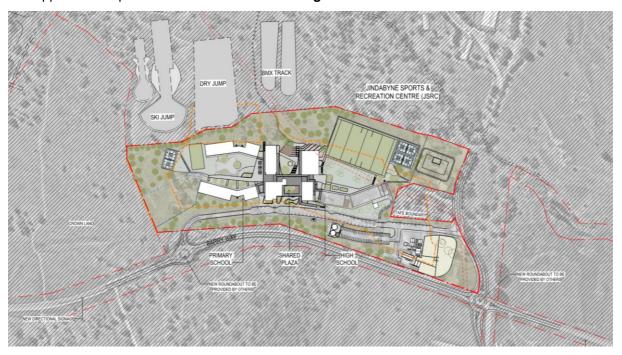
APPROVED SCHOOL SITE PLAN - SSD-15788005
